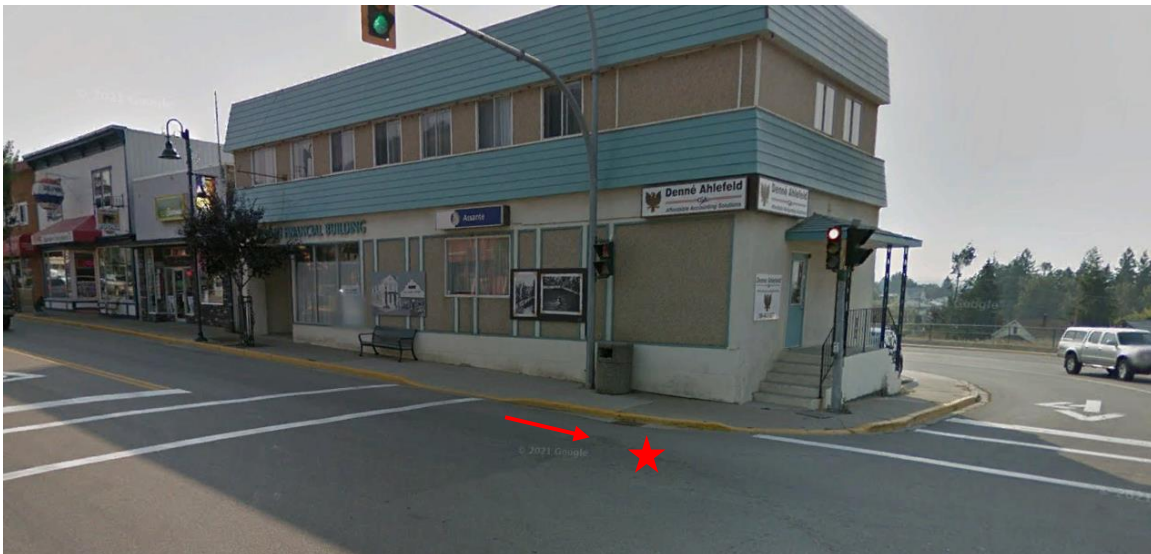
Cook Street / Canyon Street (Hwy 3) / 10 Ave N Crosswalk Relocation
